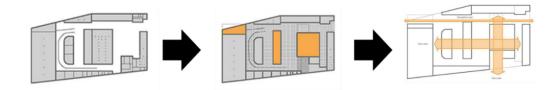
Design process Plan schema Drawing © OMA 2015
